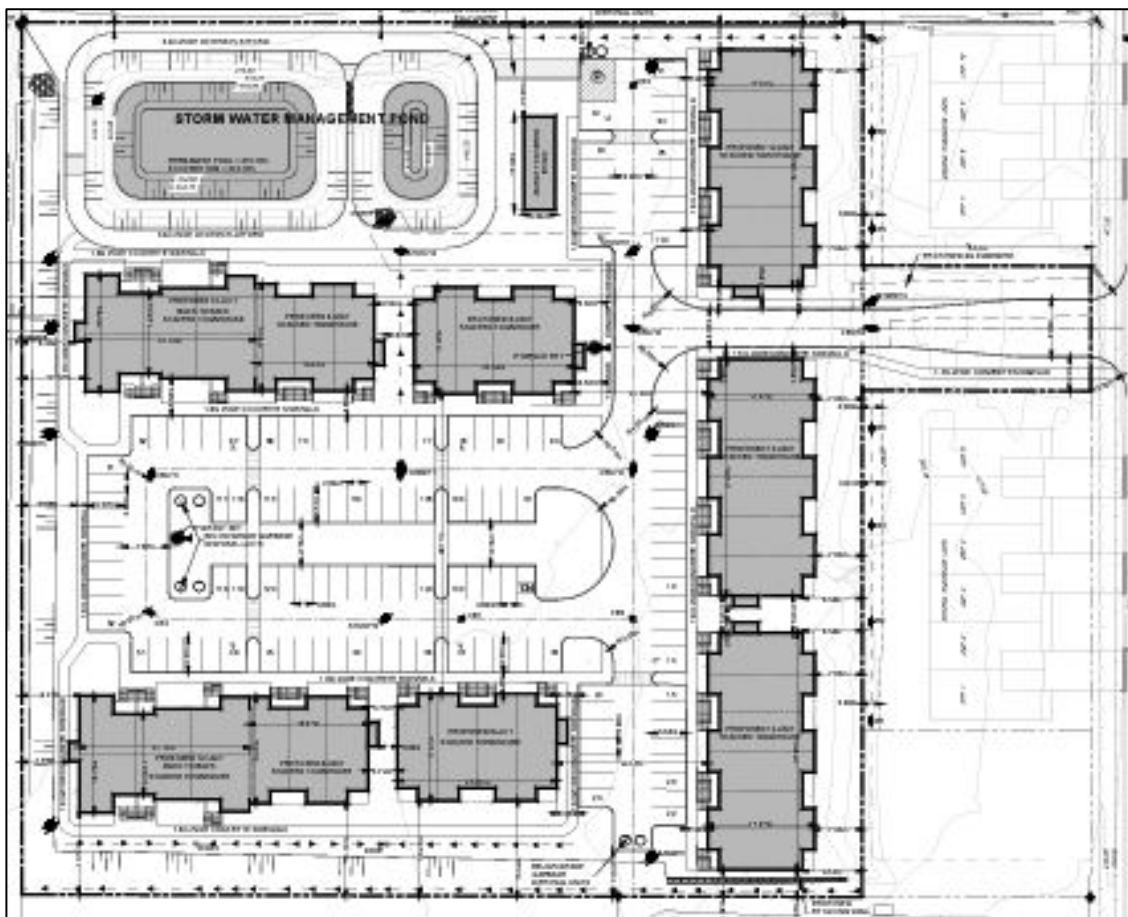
Proposed Site Plan prepared by Cobide Engineering Inc., August 2024.
